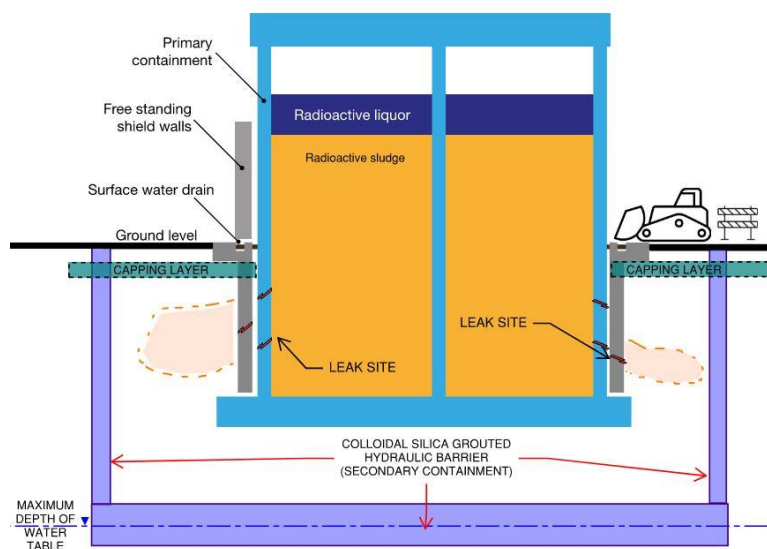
Secondary containment colloidal silica grouted hydraulic barrier.
